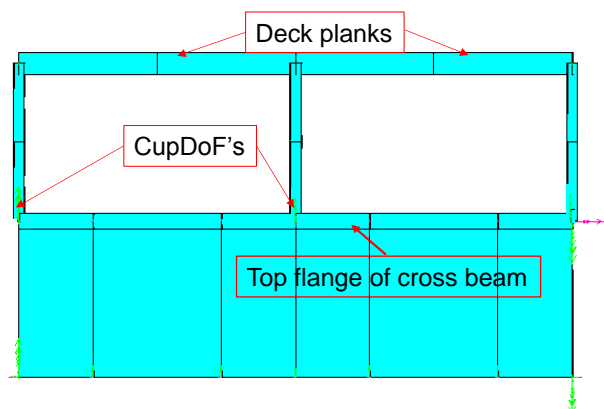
The aluminium deck planks and top flange of cross beam connection.
